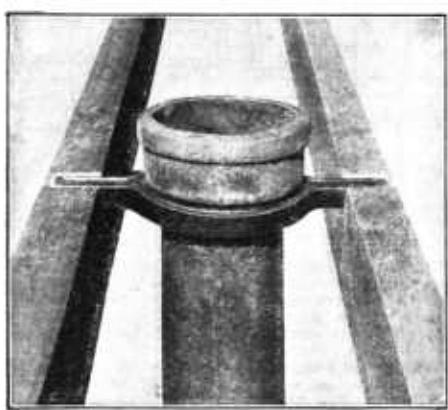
Cast-iron pipe rest notched into two floor joists
